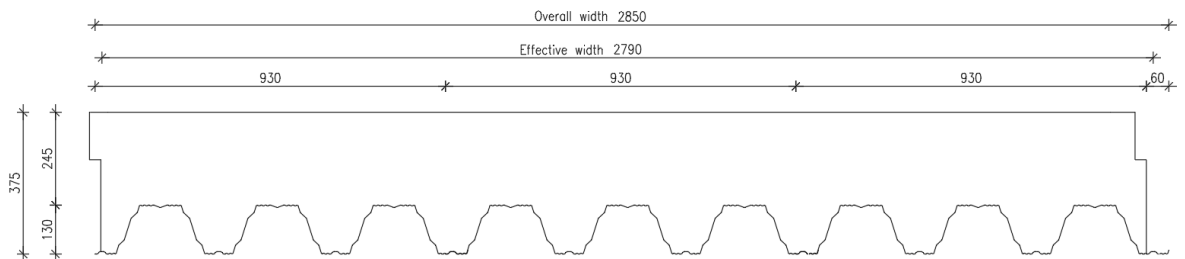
Three-sheet wide prefabricated roof element (retell Kesti 2018c).
